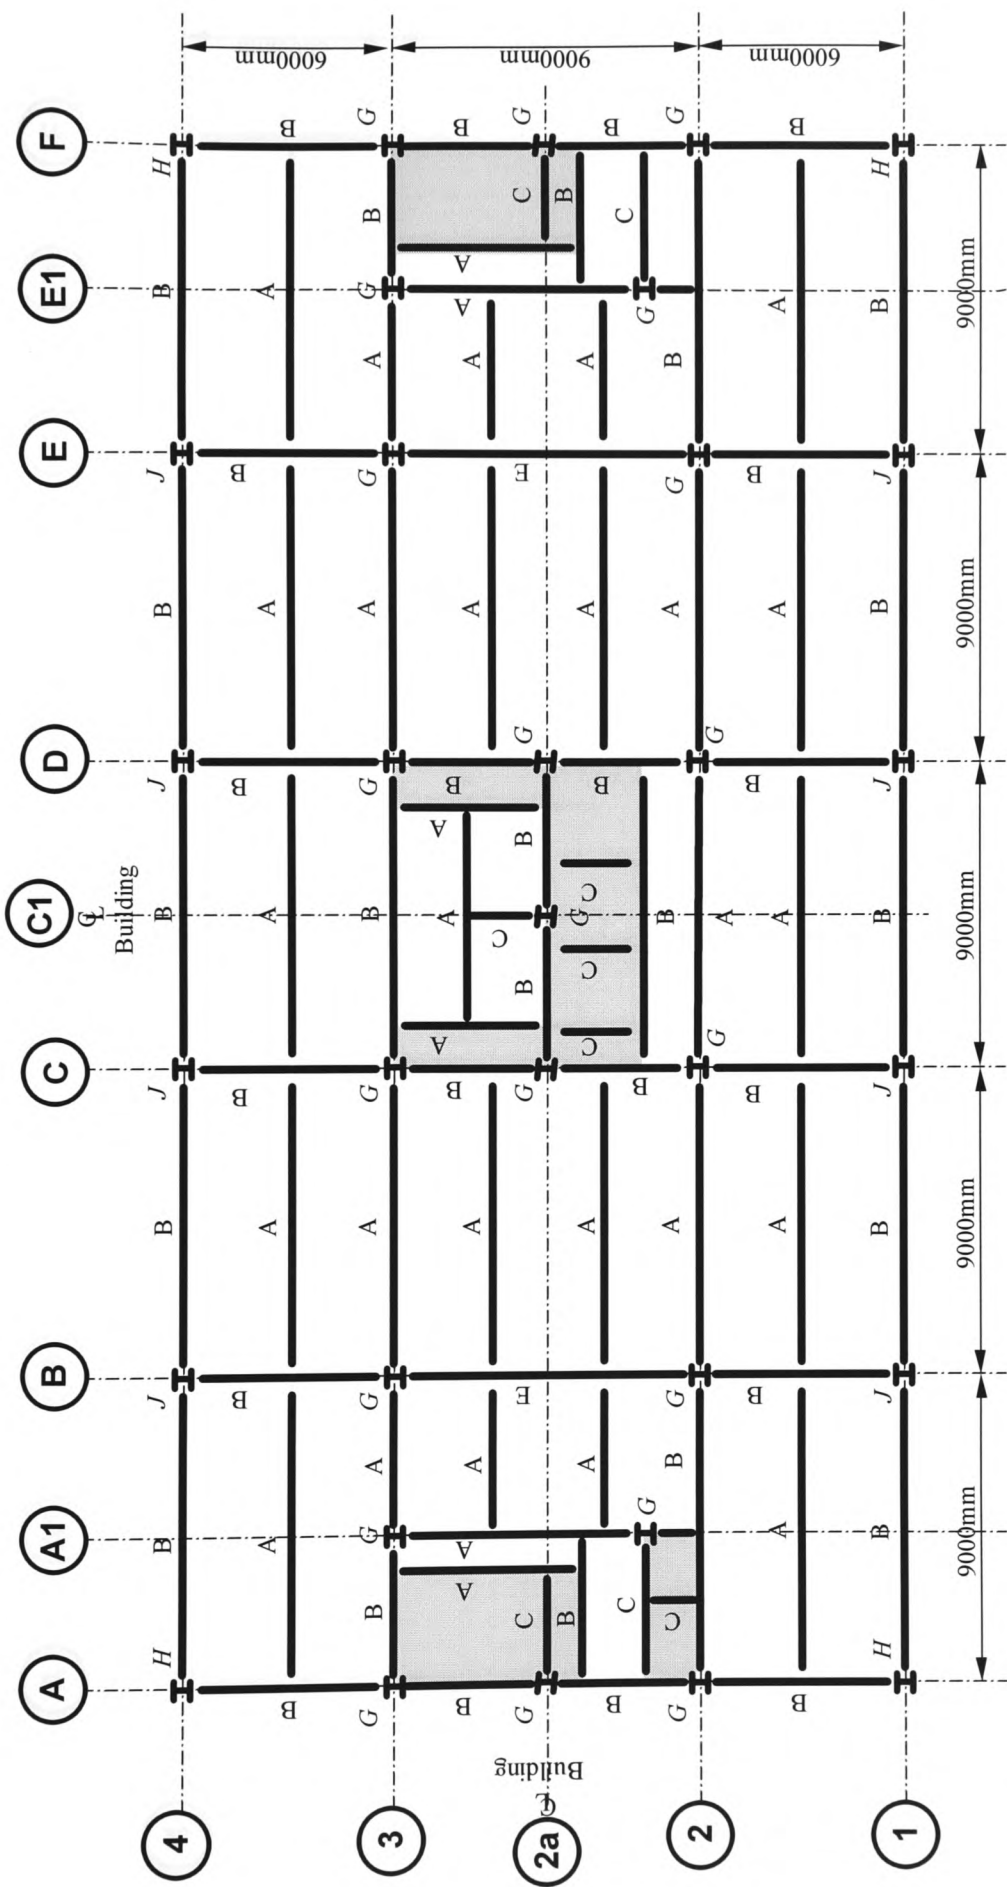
Plan on the 3rd and 4th floors (similar) showing the general layout of the main structural elements
